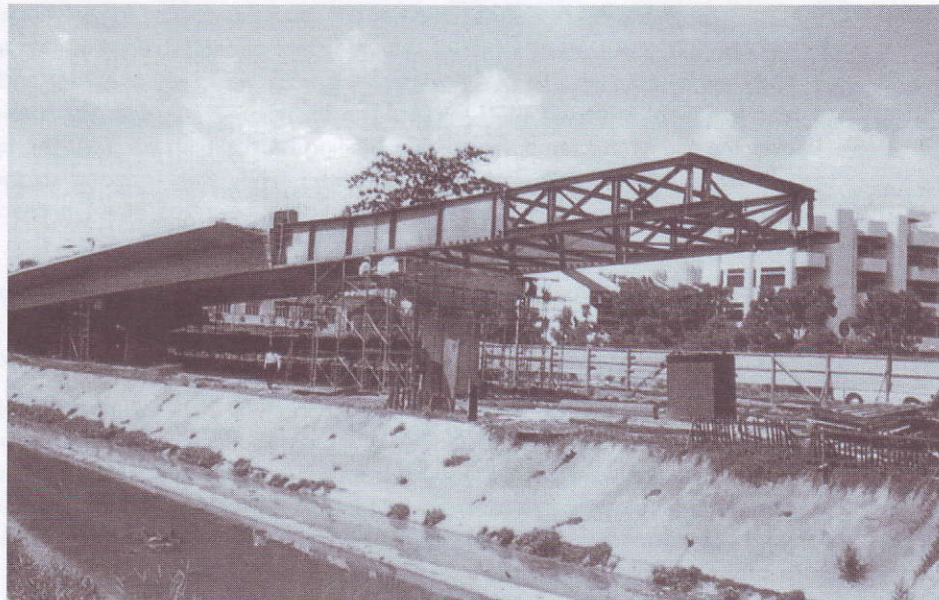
Steel launching nose for the construction of Whitley Road Flyover
